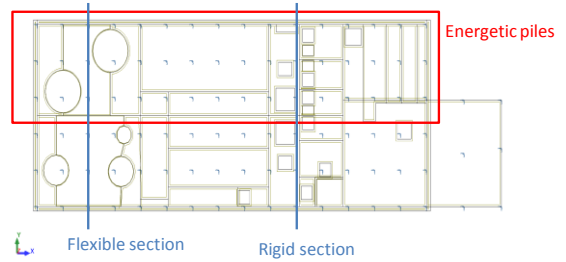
Sept-Sorts 102 piles, 48 energetic piles.
